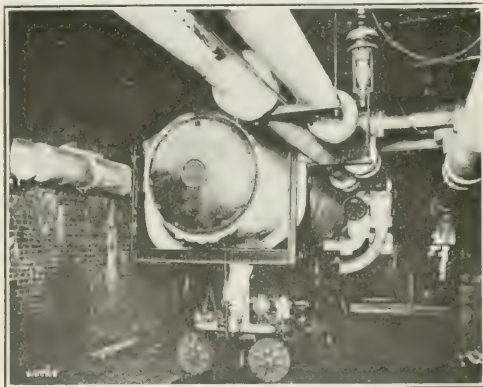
Exhaust Feed-Water Heater and Pumps in Basement of Boiler-Room.
